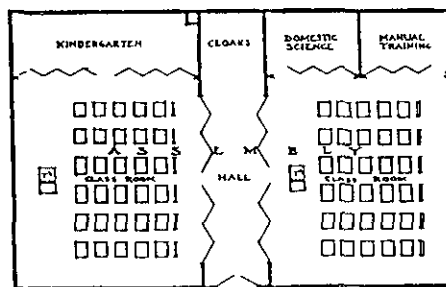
Floor Plan of a Two-Room Schoolhouse including Rooms for Domestic Science and Manual Training.
